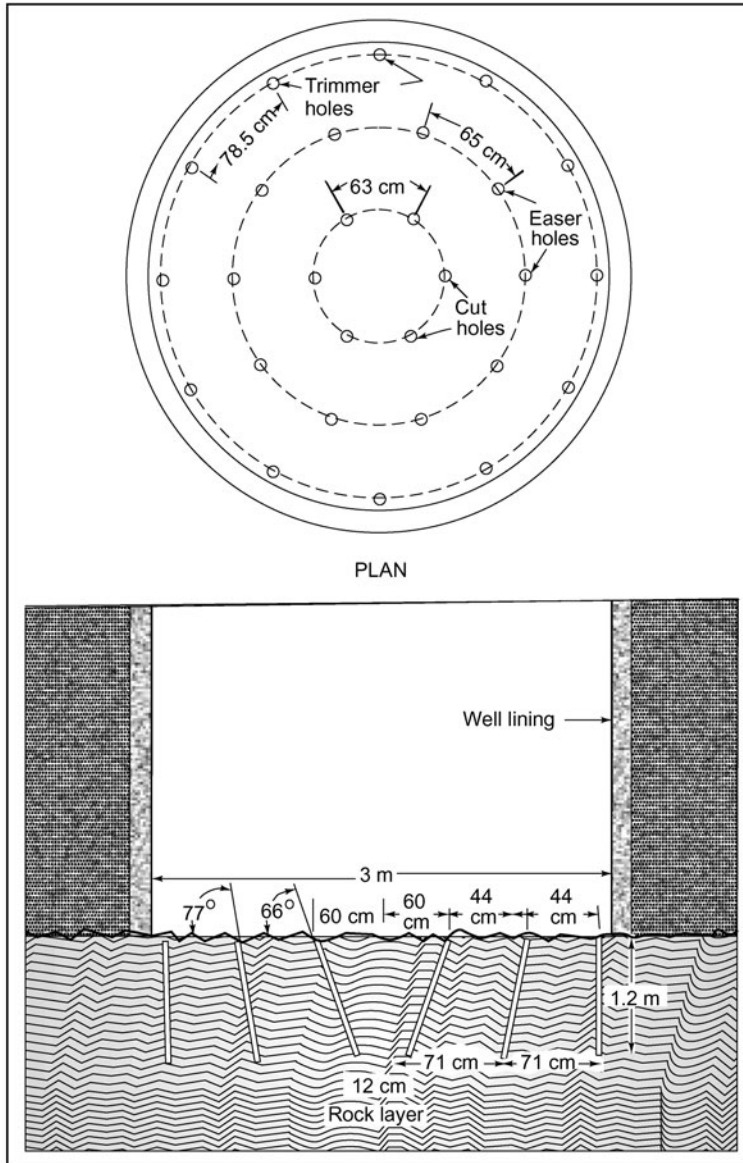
Views of a 3 m diameter circular well showing a typical layout of shot holes for blasting
